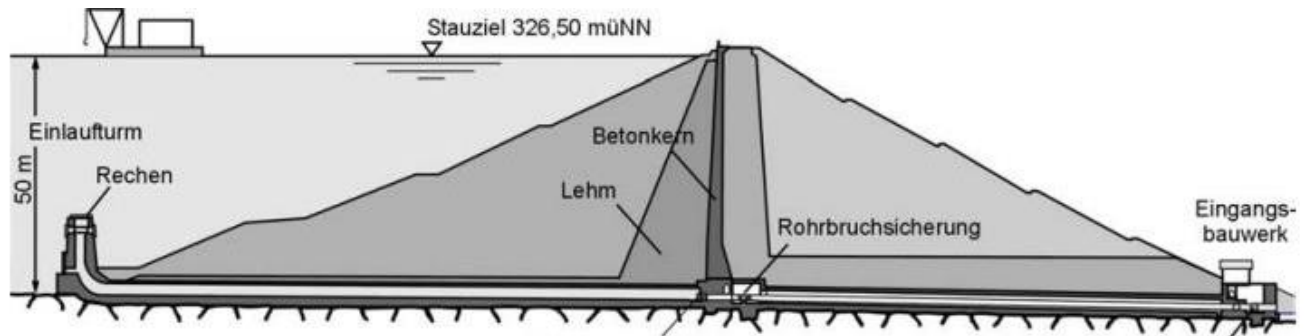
Dam construction concept of the Sösetalsperre (Campen, 2002)
